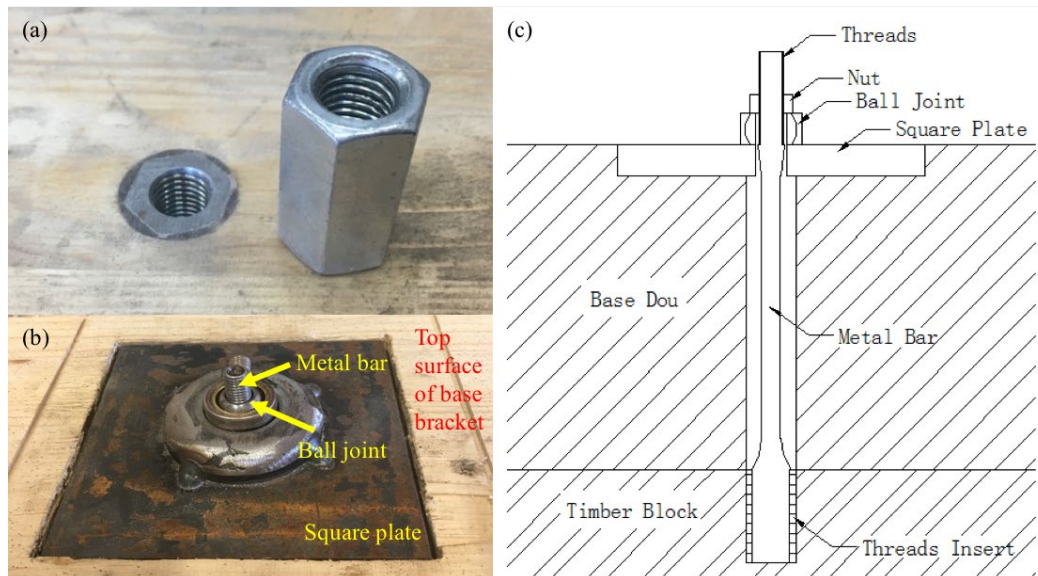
(a) 12mm threads insert; (b) Square plate and ball joint; (c) Details of metal bar connection
